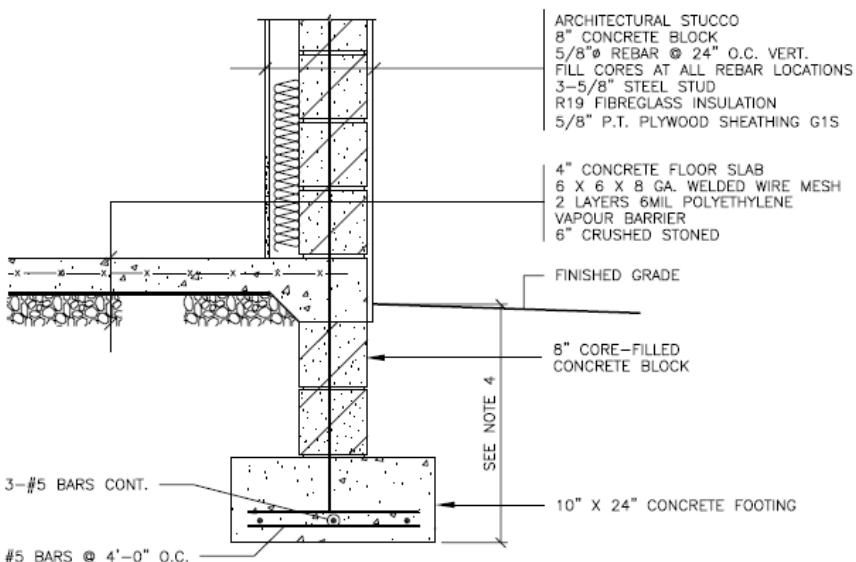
Typical Equipment Building Structural Design – Key Structural Design Areas Highlighted
